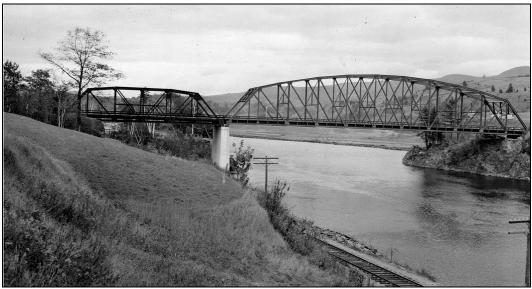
Barnet Road Bridge. Downstream side from Vermont in 1941 (NHDOT 1941).
